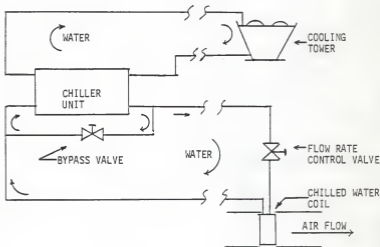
Chiller Unit--Chilled Water Coil--Cooling Tower system.
